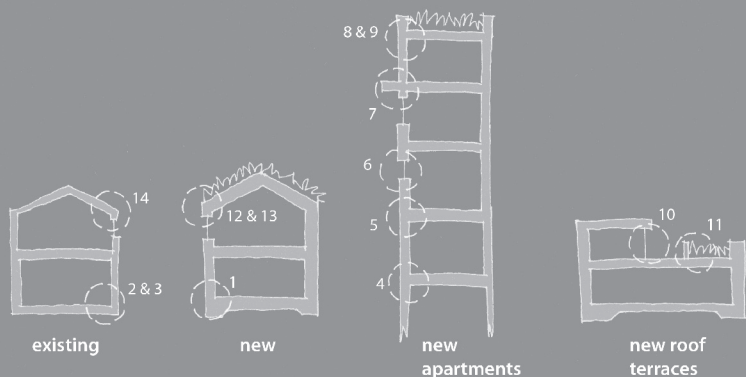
The locations of key details 1–14 on both new and existing buildings
